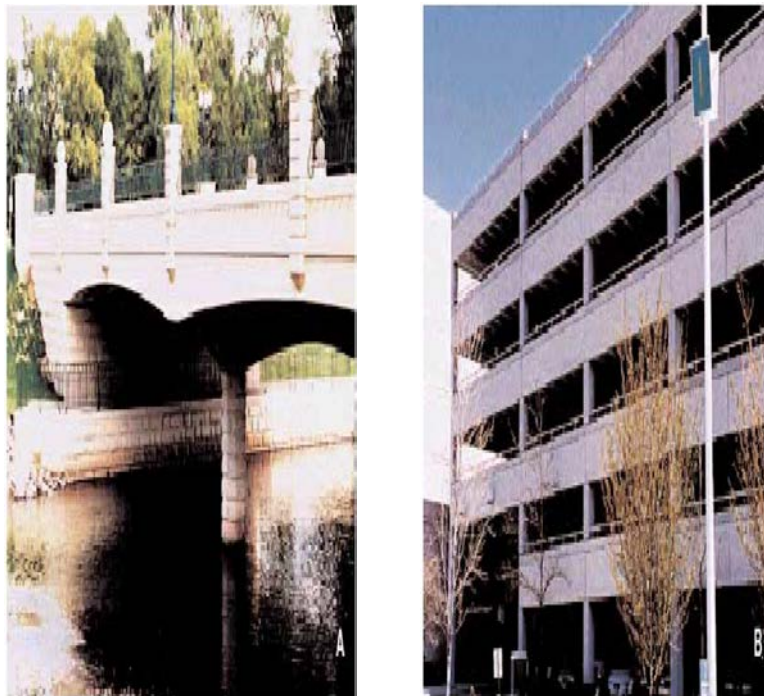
Although they can be used in general construction, silica fume and metakaolin are often used in applications such as (left) bridges and (right) parking garages to minimize chloride penetration into concrete. (68681, 69542)
